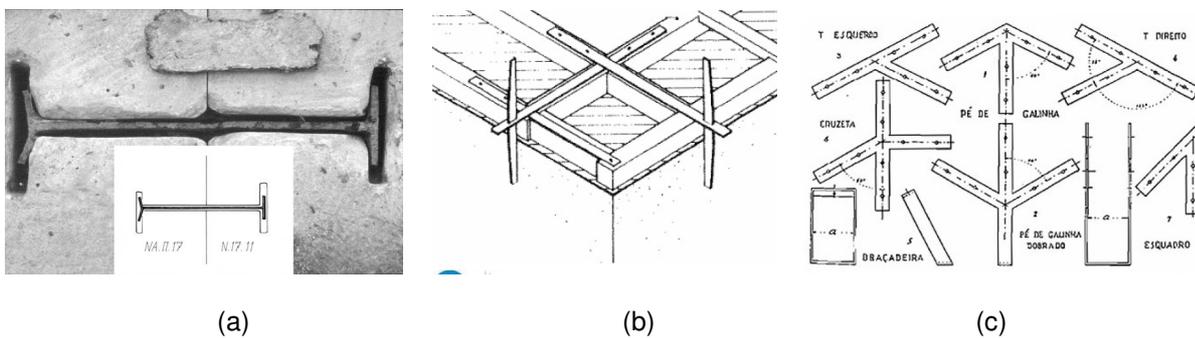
(a) Tension connecting element in ancient monument, (b) anchored tie in masonry structure, (c) nailed connecting plates in timber roof trusses.
